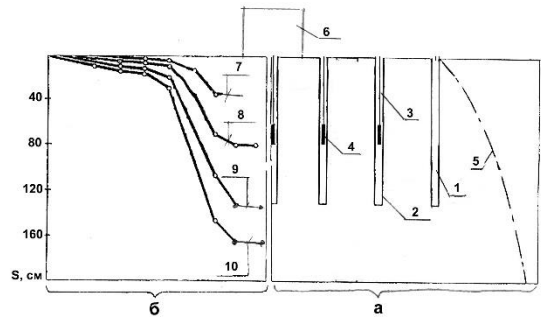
Cross section of the site under research (residential building No. 16). a - layout of foundation preparation by hydroblasting method; b - soil surface deformation curves:
